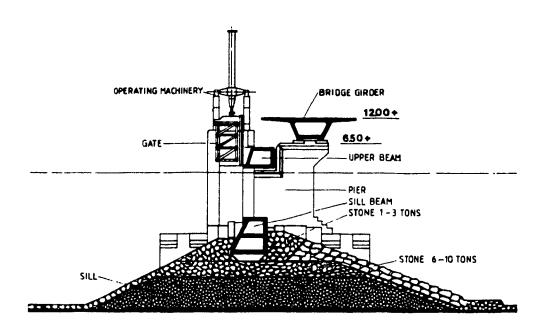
CROSS-SECTION OF STORM SURGE BARRIER
